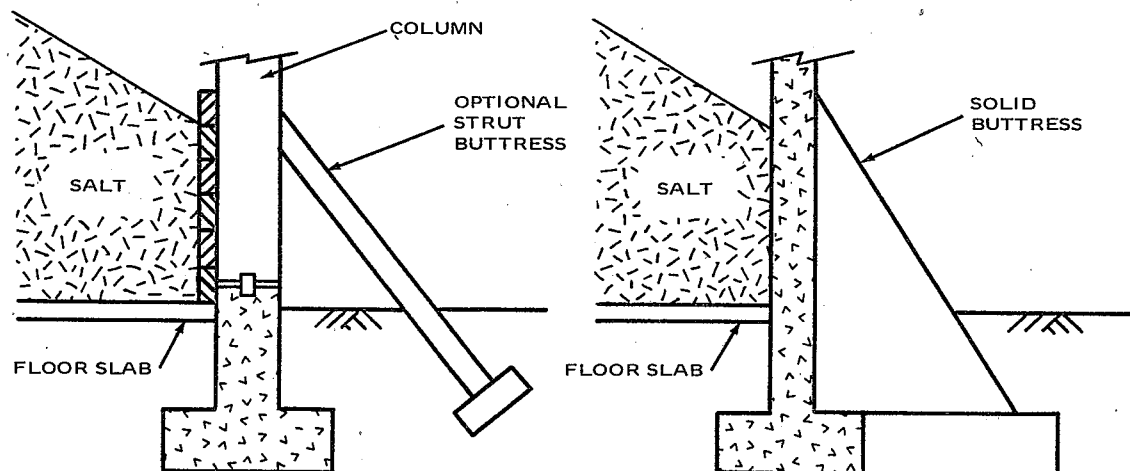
Typical sections of strut (on left) and solid (on right) buttresses
